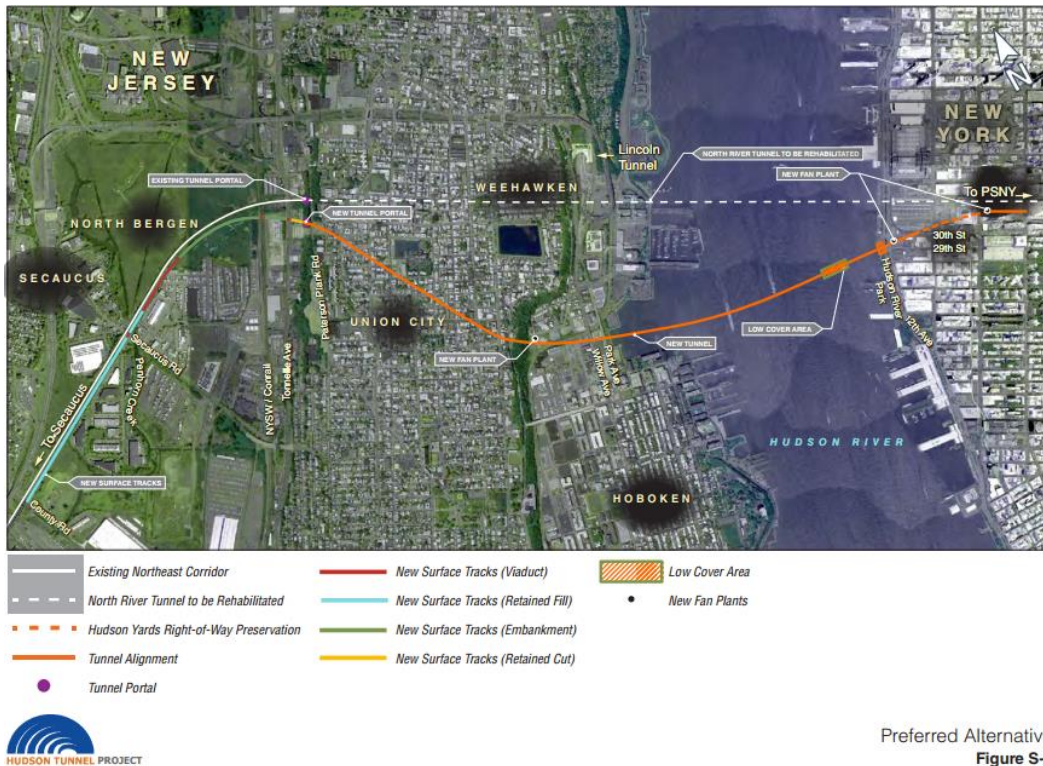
Preferred Alternative showing the Alignment of the new Hudson River Tunnel Alignment and Rehabilitation of the Existing North River Tunnel
